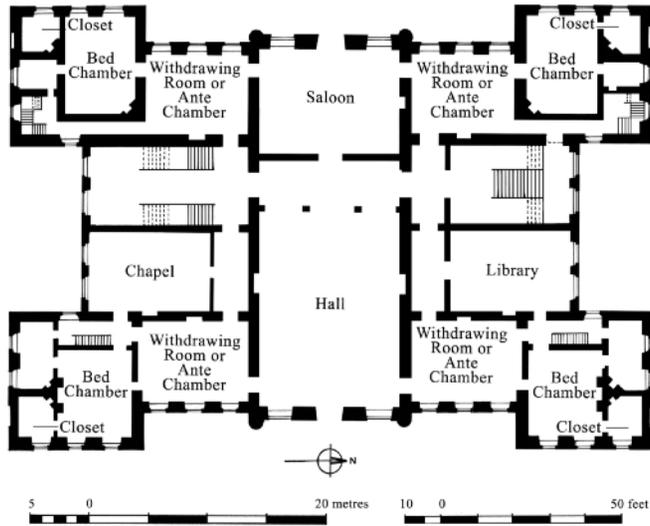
Plan of the ground floor of Ragley Hall Warwickshire built for Edward, first Earl of Conway in 1681-3. *Drawing, Melissa Beasley.
